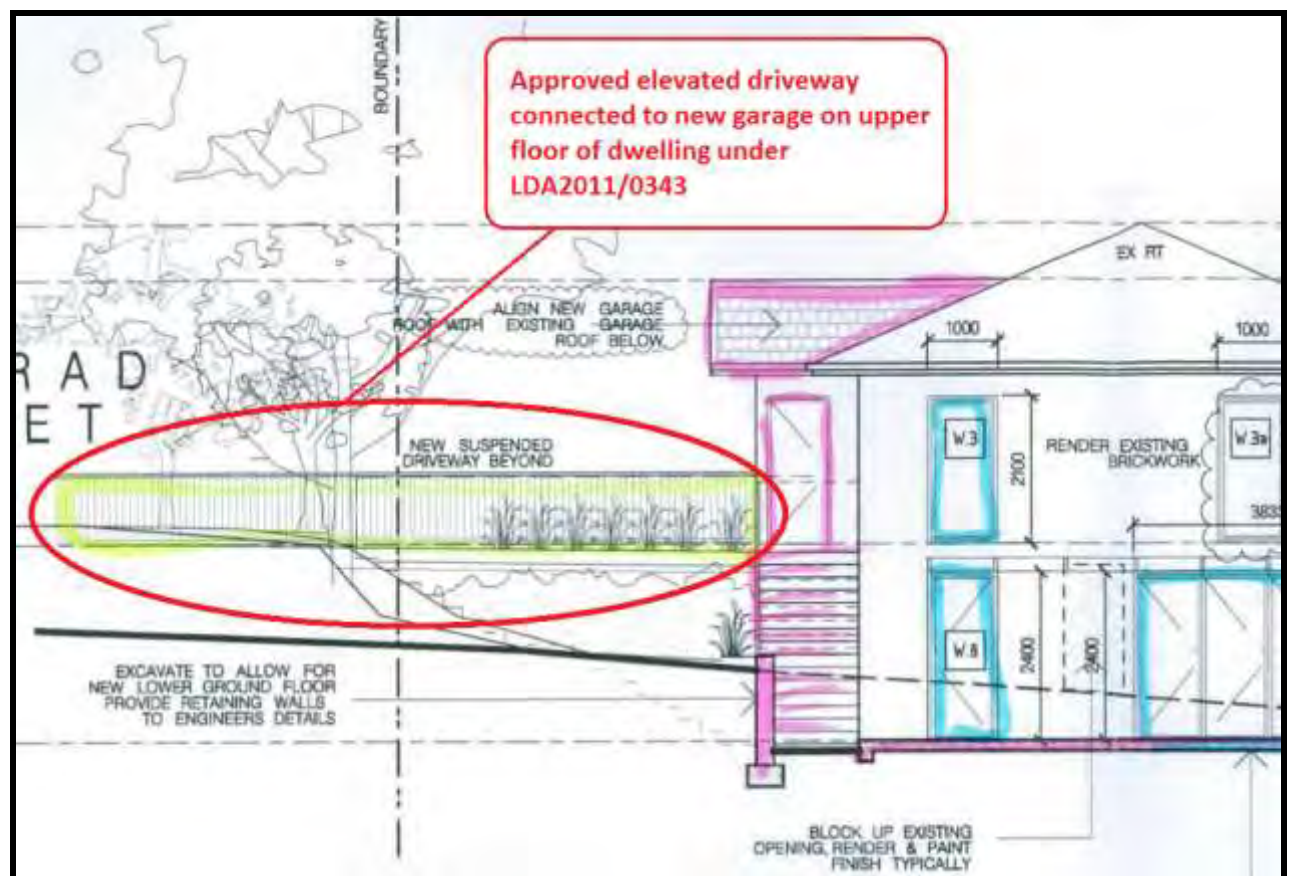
Extract of elevation from stamped plans of LDA2011/0343 showing the approved elevated driveway structure connecting to the garage on the upper floor of the dwelling.
